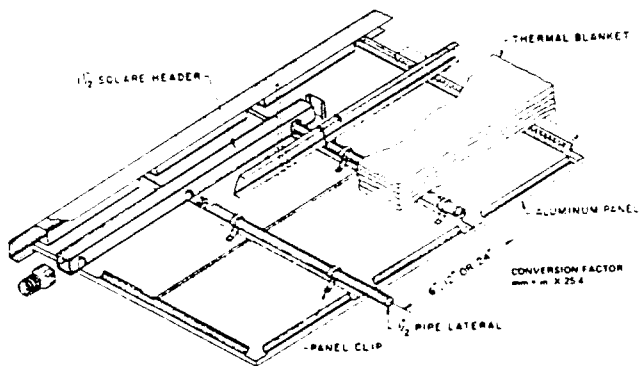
Metal Ceiling Panels Attached to Pipe Laterals
